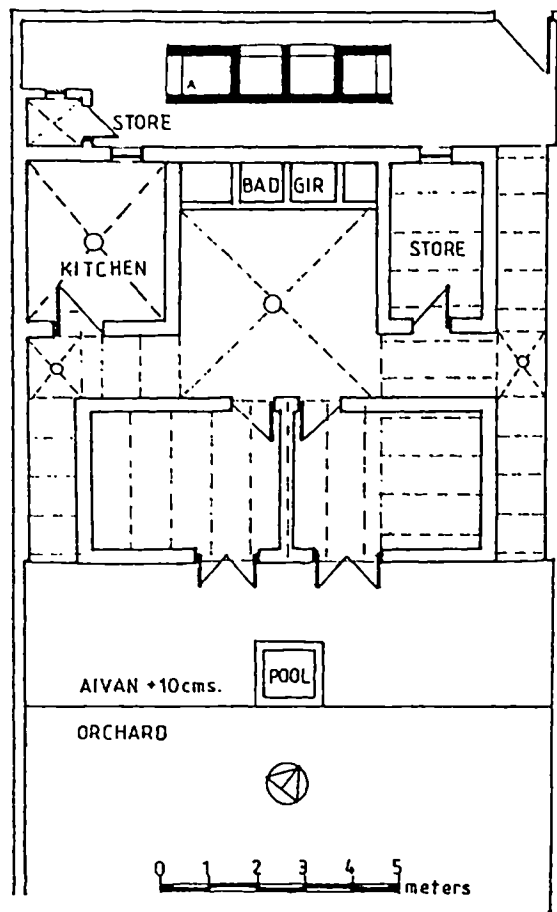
Plan of the compact house at Bunderabad, with A) inset showing plan of badgir at vent level.
